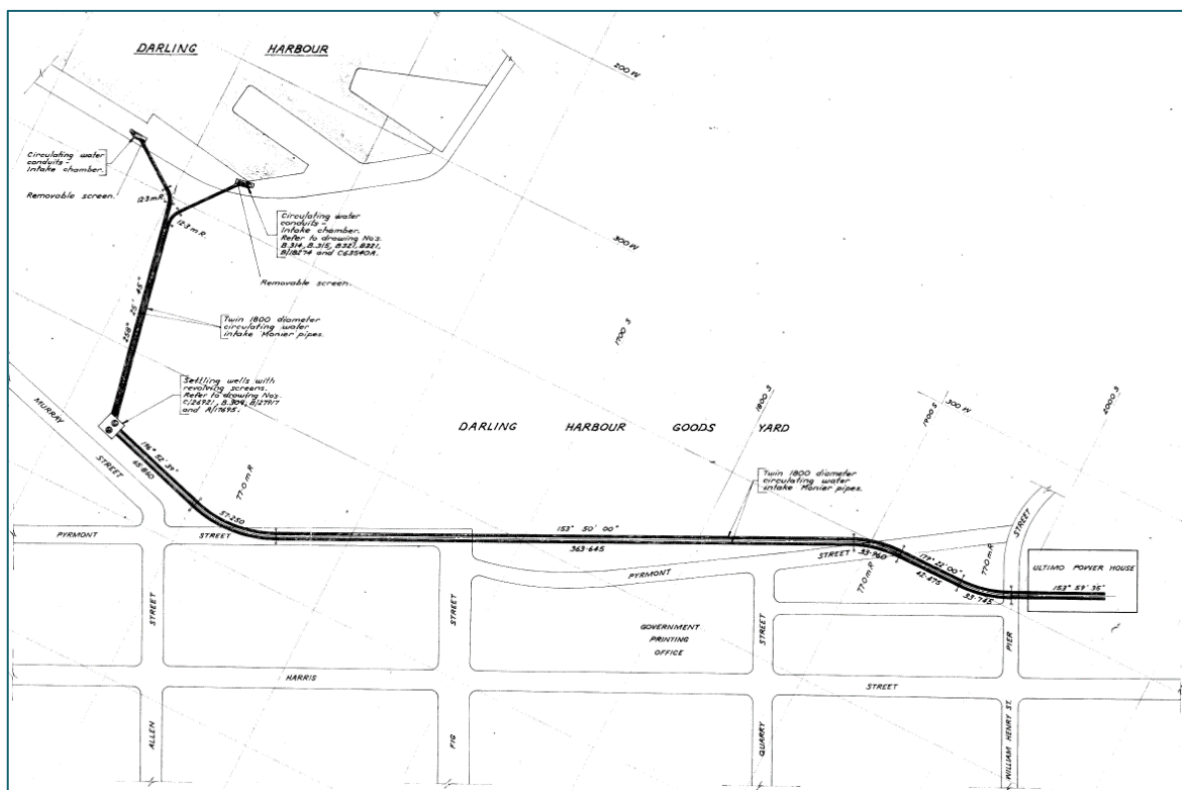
Plan of Powerhouse Seawater Conduits (Source: GAO Plan C82-079G/SC-001, Nov 1982)
